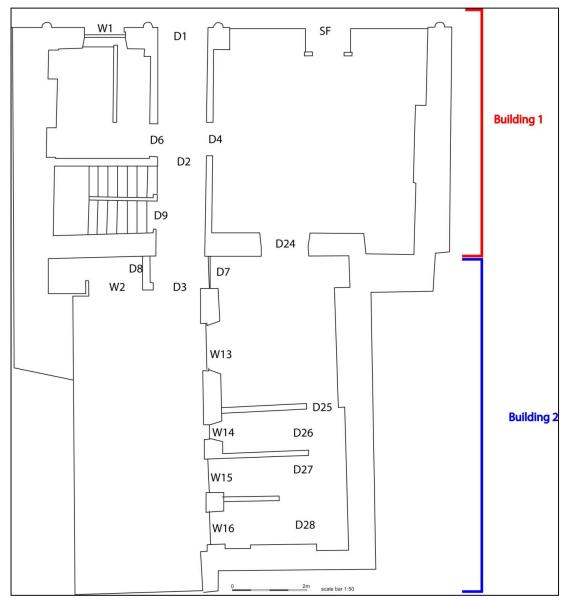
PLAN SHOWING GROUND FLOOR DOOR AND WINDOW NUMBERS.
